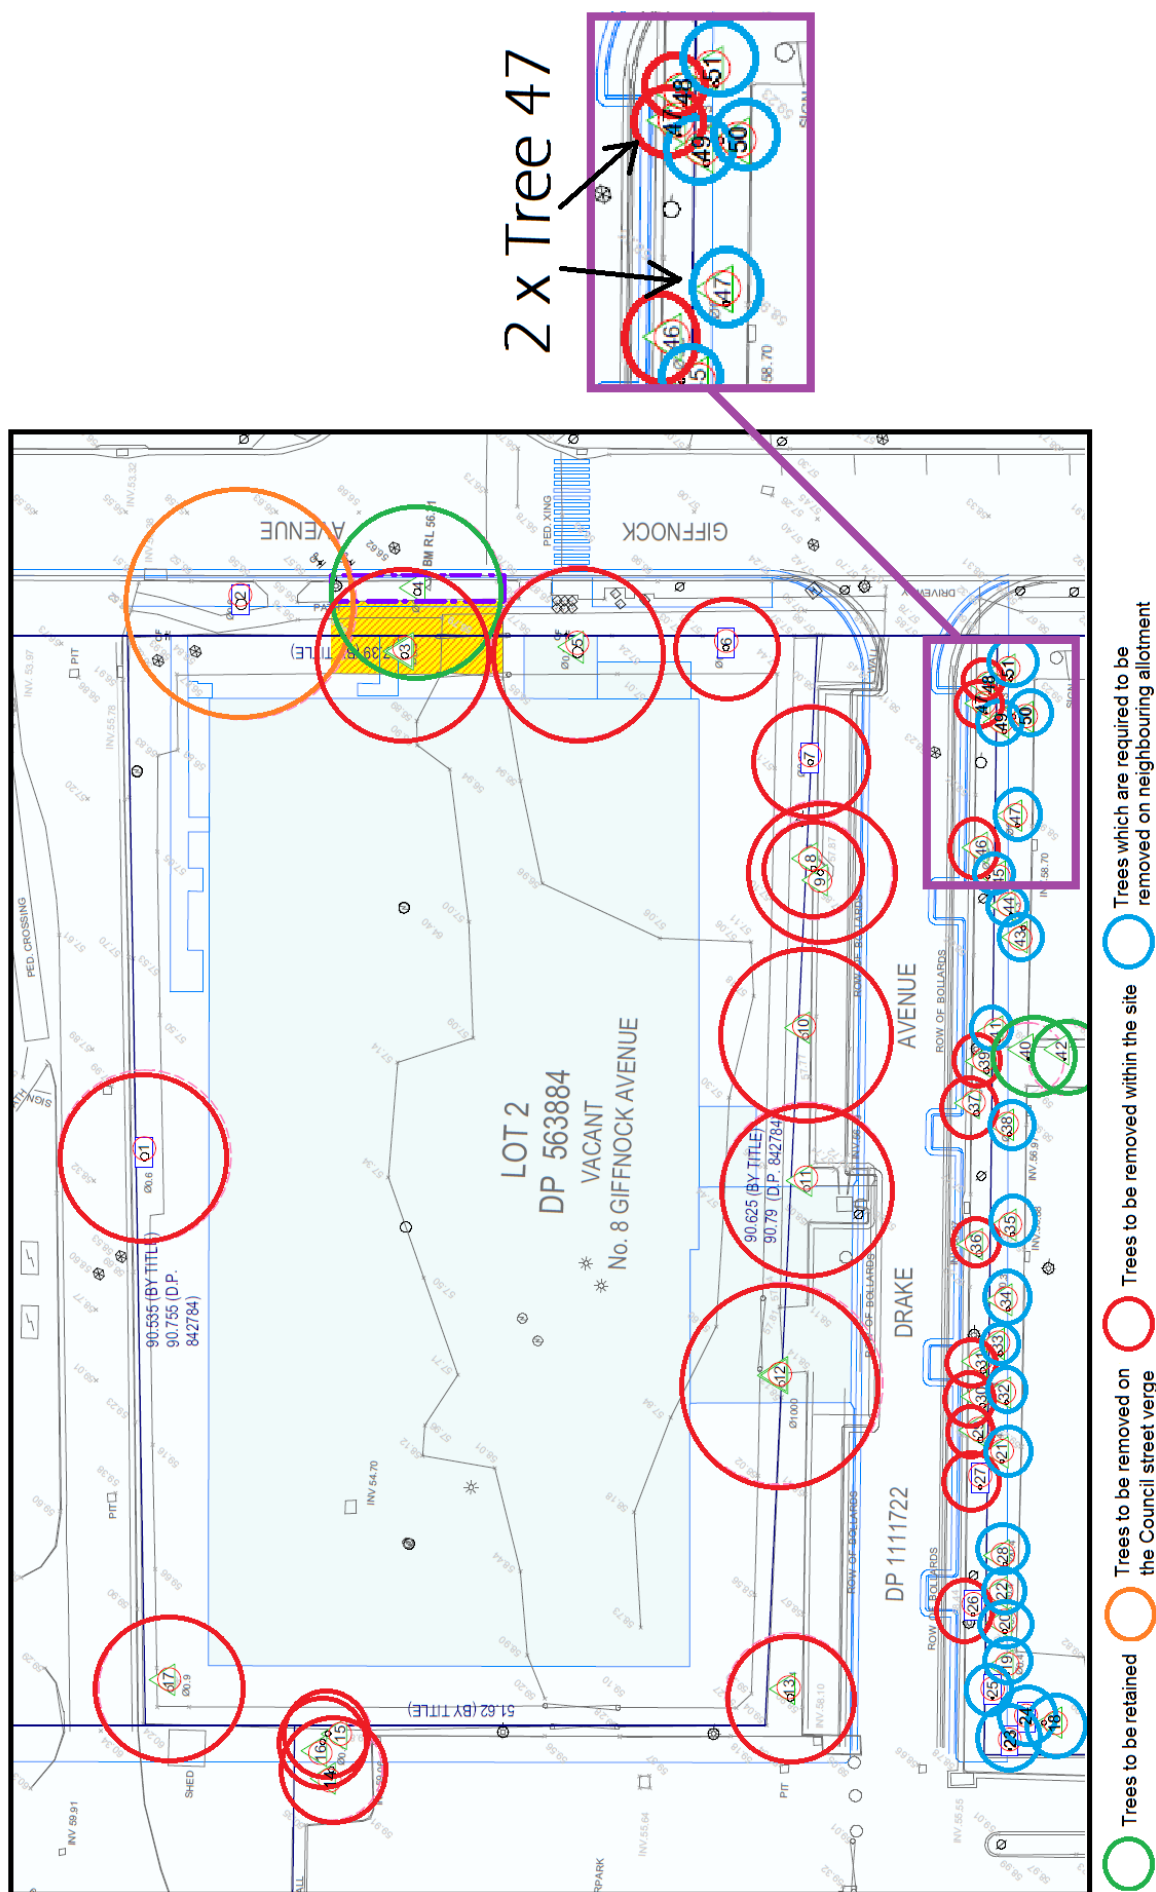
Survey showing existing trees on the site and neighbouring allotment – Tree 47
